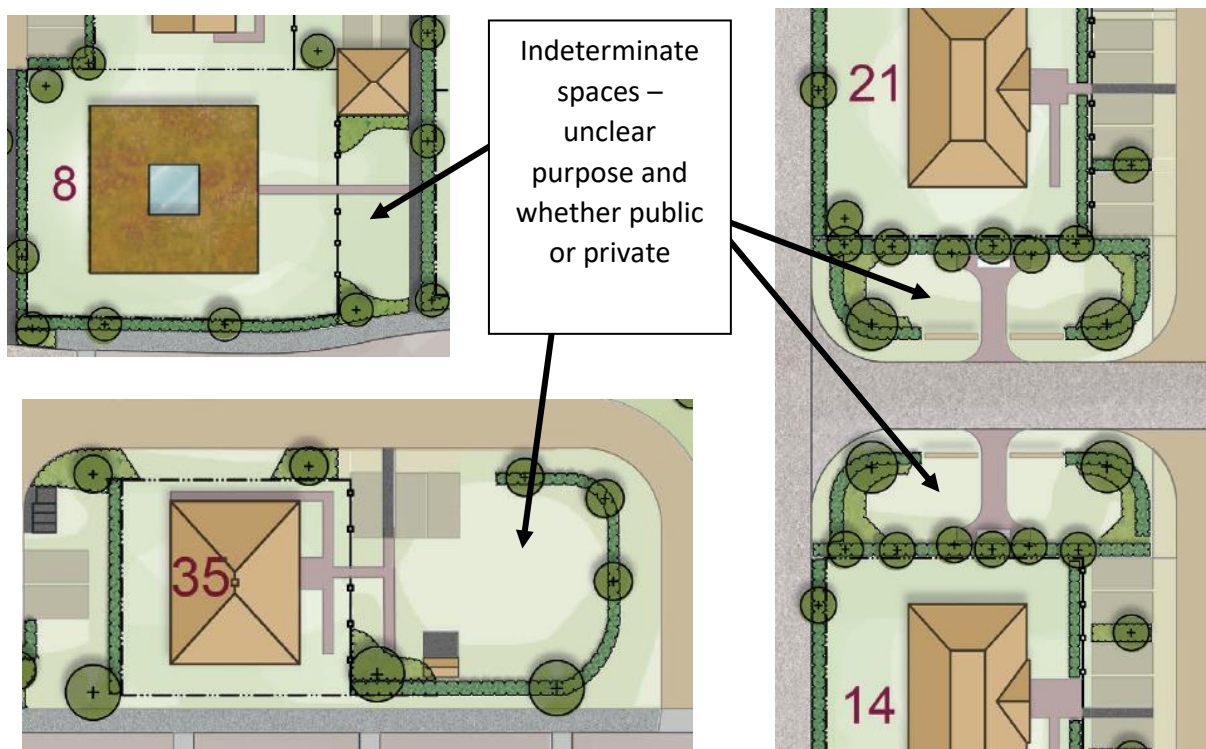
Extracts from the Site Layout Plan to show indeterminate spaces within the layout
